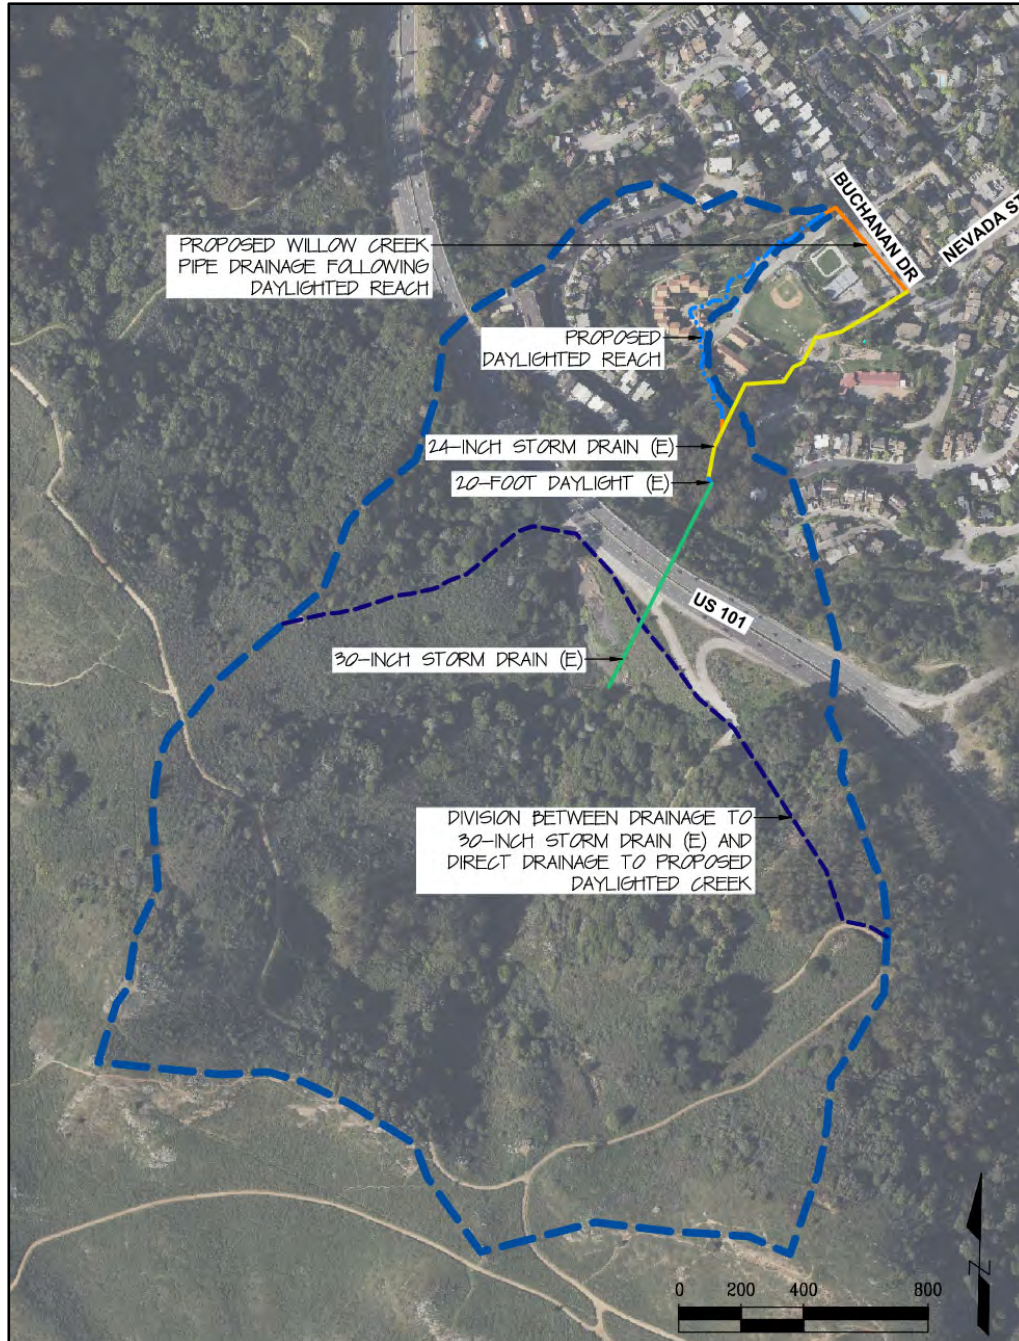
Willow Creek watershed and key drainage features. Note, the 30-inch storm drain increases to 48-inches under 101 and constricts back to 30-inches prior to the 20-foot daylight outfall.
